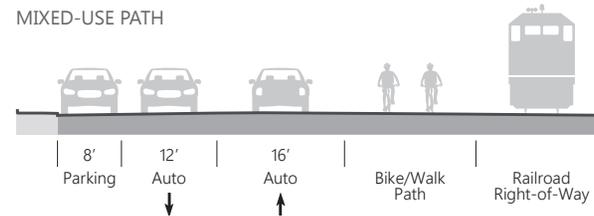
SALT LAKE AVENUE FUTURE CROSS SECTION
